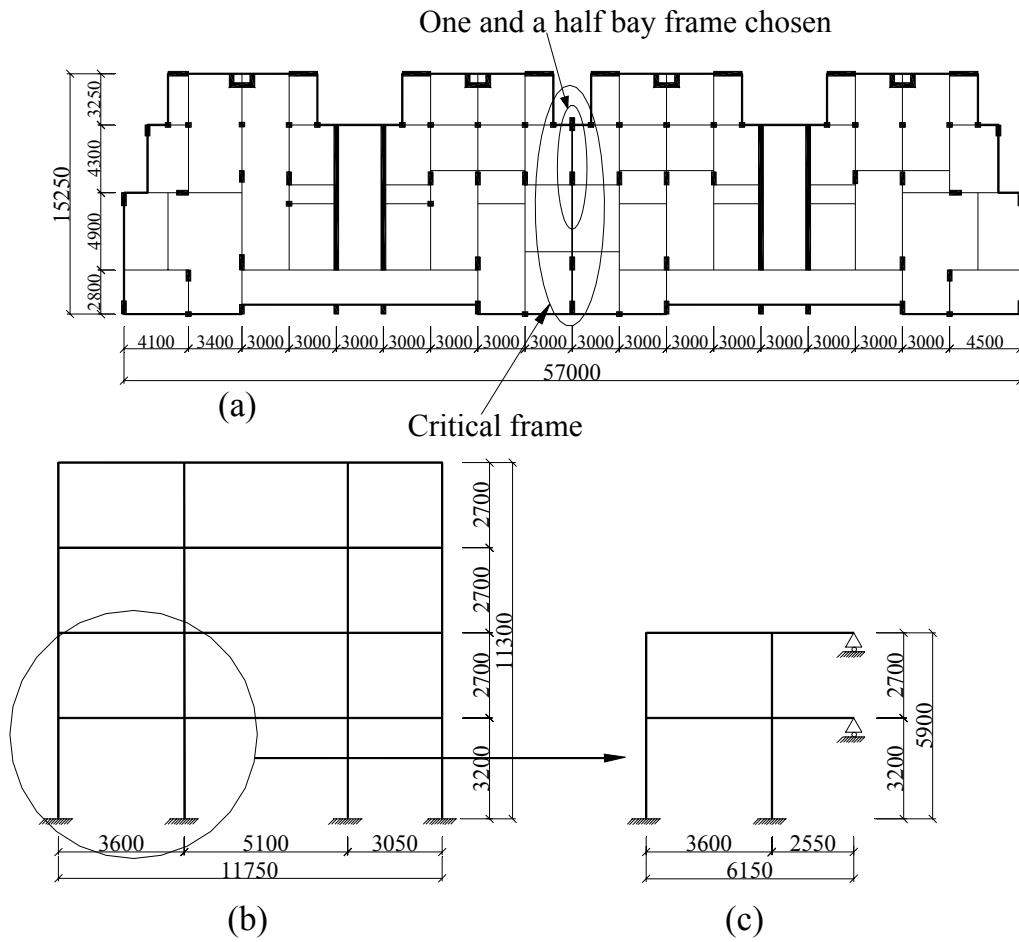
Prototype structure: (a) plan view of the whole building (b) selected critical frame (c) two story- one and a half bay frame chosen for the test model
